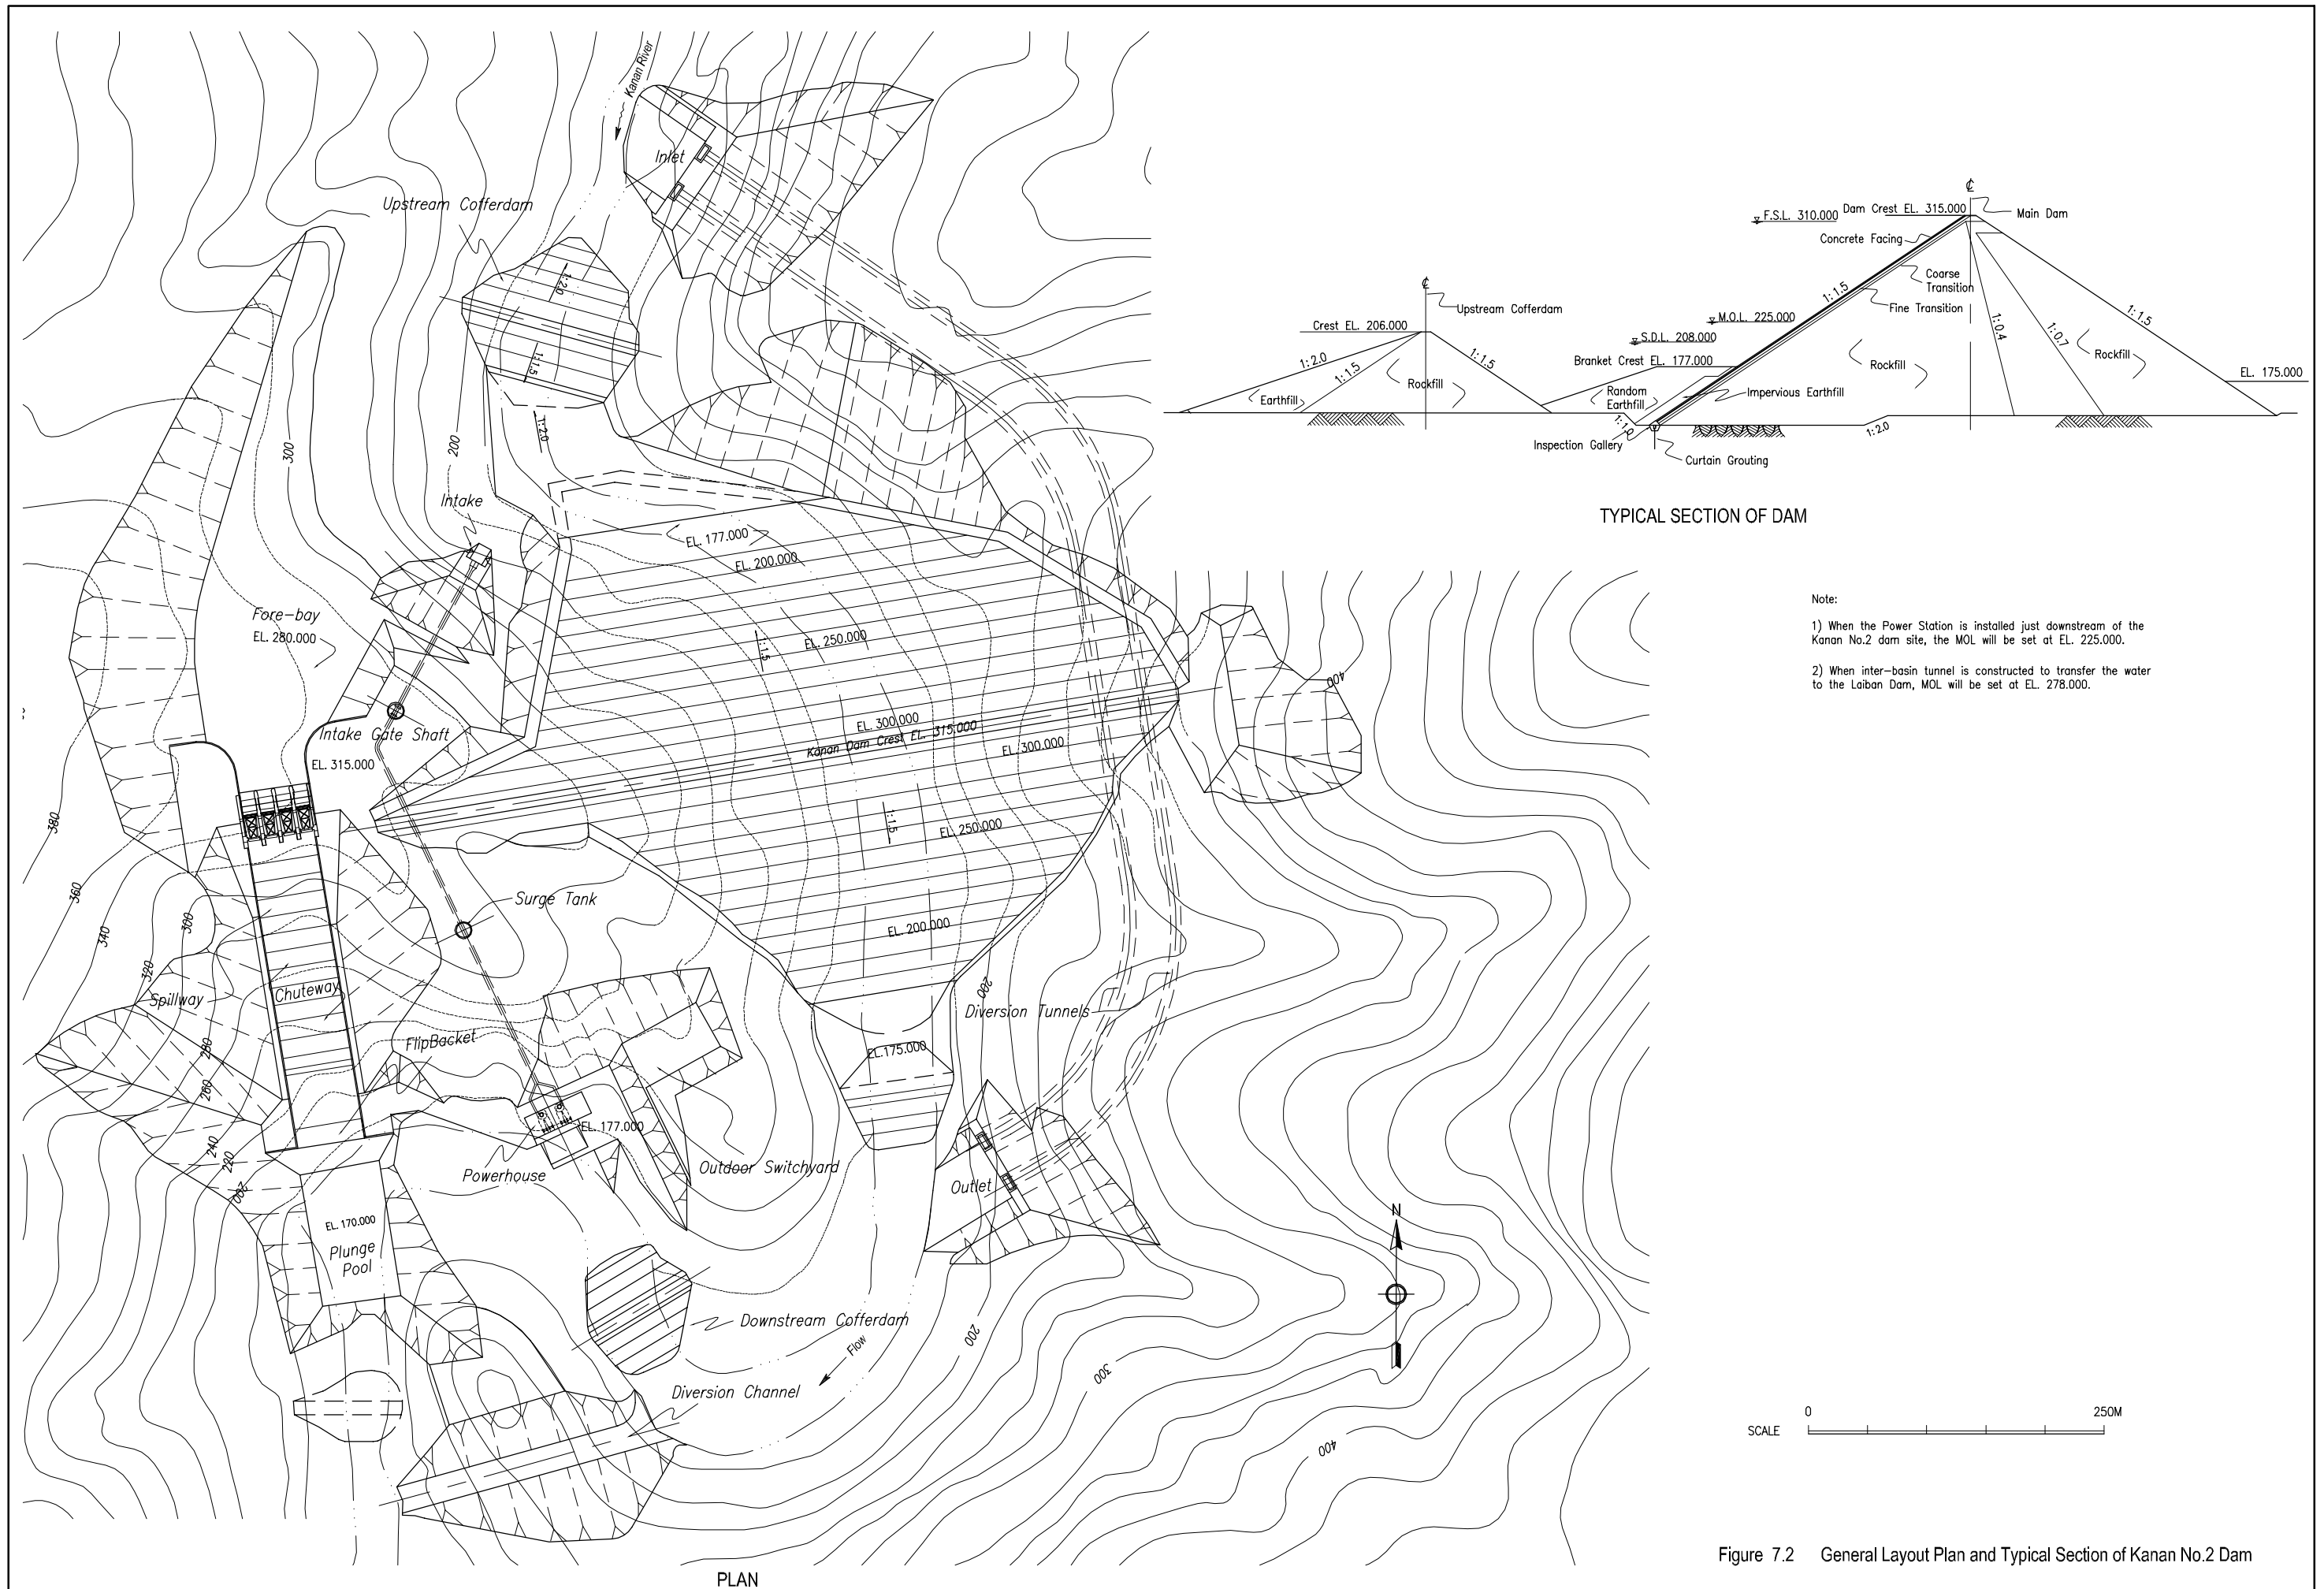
General Layout Plan and Typical Section of Kanan No.2 Dam
